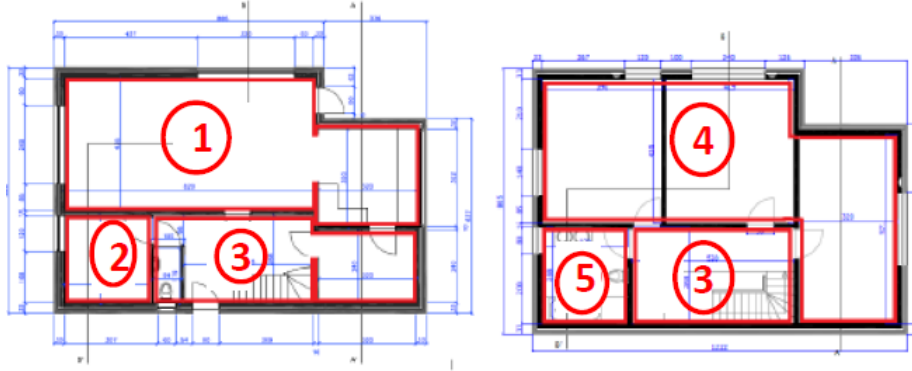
Division of the detached (D) dwellings into zones: first (left) and second (right) floors.
